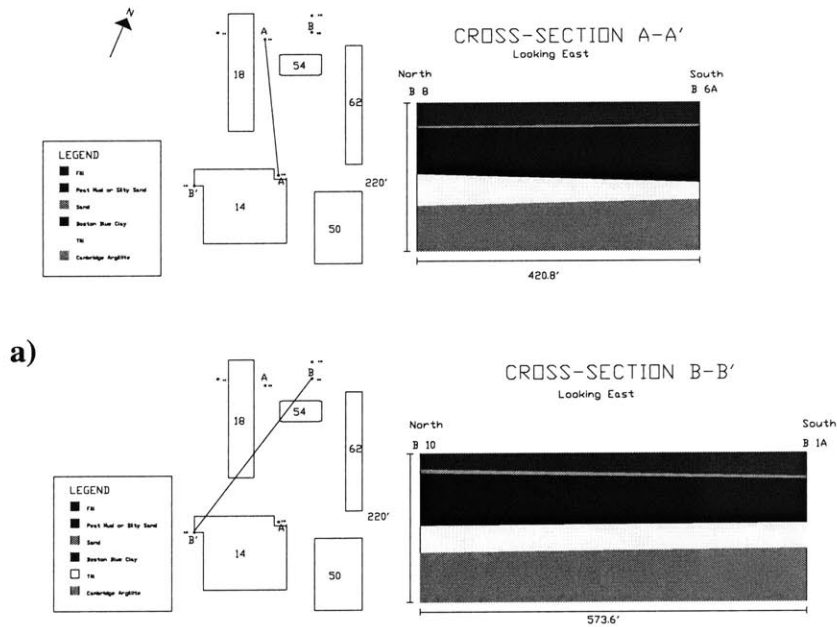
Cross-Sections of Subsurface Geology a) Cross-section A-A', b) Cross-Section B-B' (see Figure 3.3-2 and
